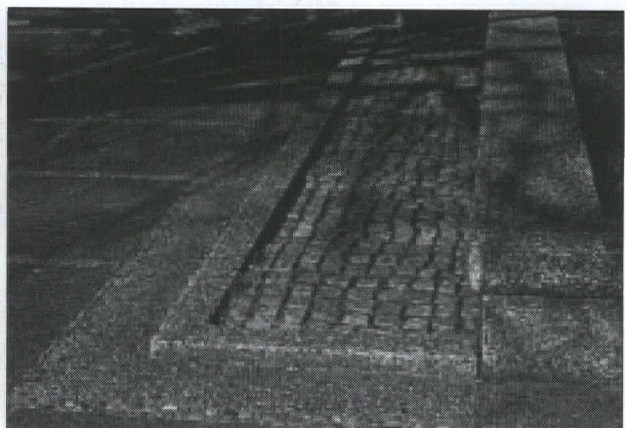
A narrow band of granite sets trims the corners of the reflecting pool and lower plaza, 1997, see plan sheet 30. Shown as a planting area on early planting plans, the granite sets were installed by 1936 and the official opening of the park. (Land Ethics, Inc.).
